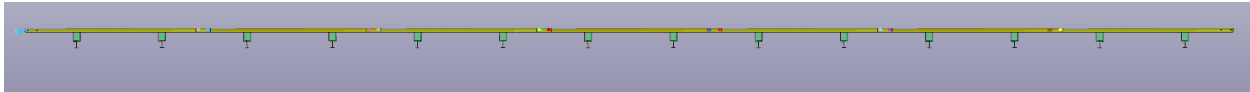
Overhead View of 87.5 ft Guardrail System
